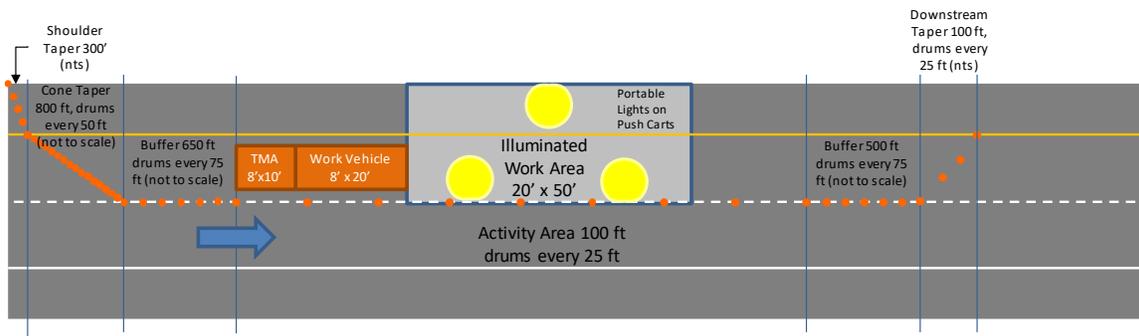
Plan sketch for bridge deck repair with a three light setup for developing lighting analysis.
